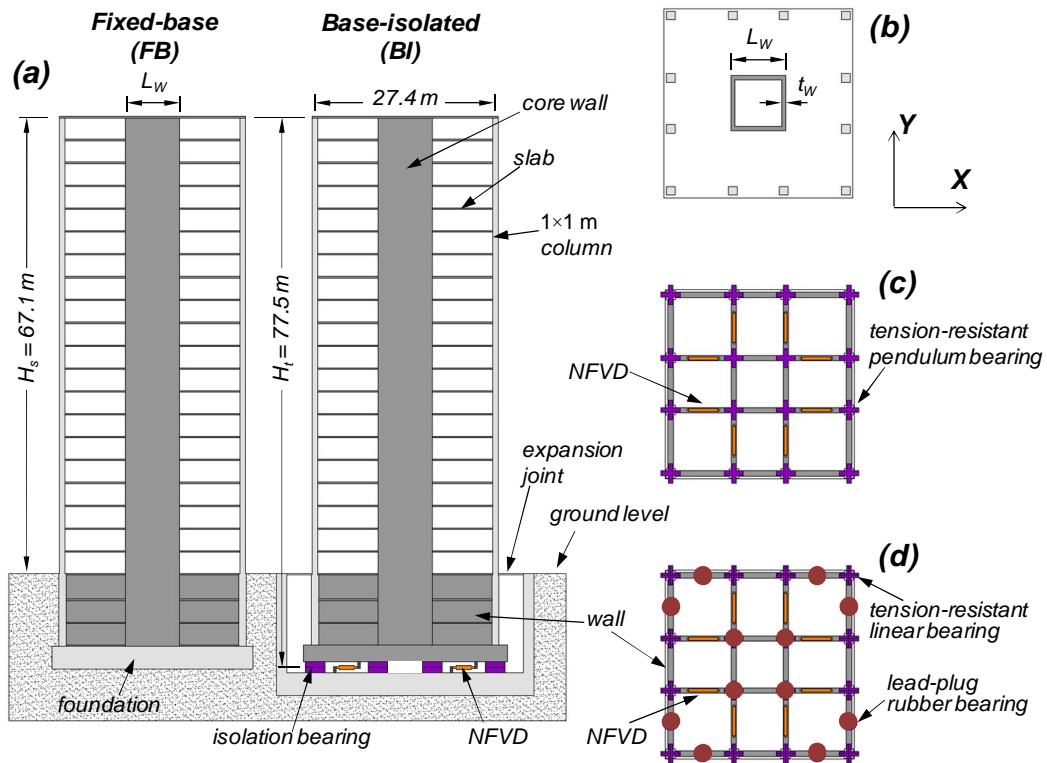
(a) Elevation of the 20-story buildings; (b) Floor plan-view above ground; (c) Plan-view of isolation system 1; (d) Plan-view of isolation system 2.
